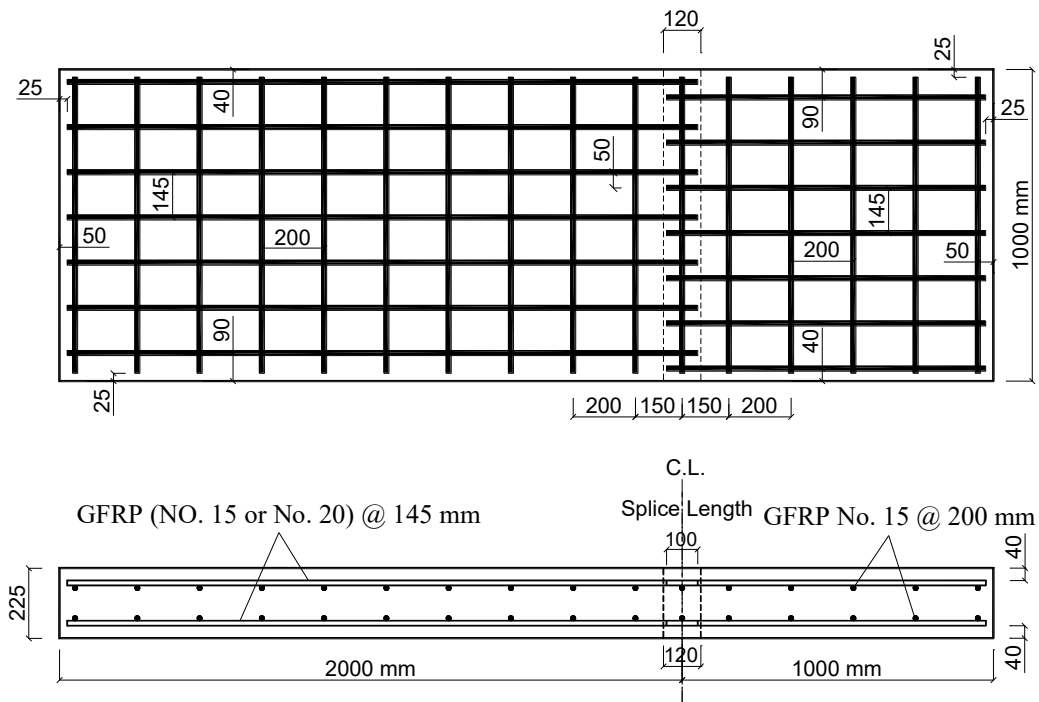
Concrete dimensions and reinforcement details of specimens G-100-15-A and G-100-20-A
